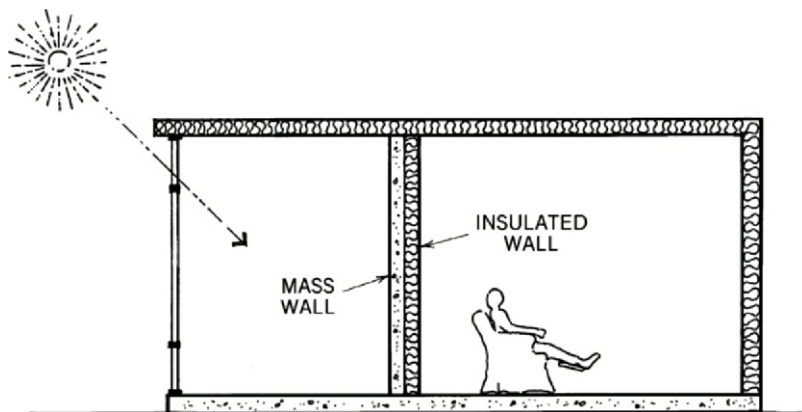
In extreme climates, the sunspace should be completely isolated from the main building by an insulated wall.
